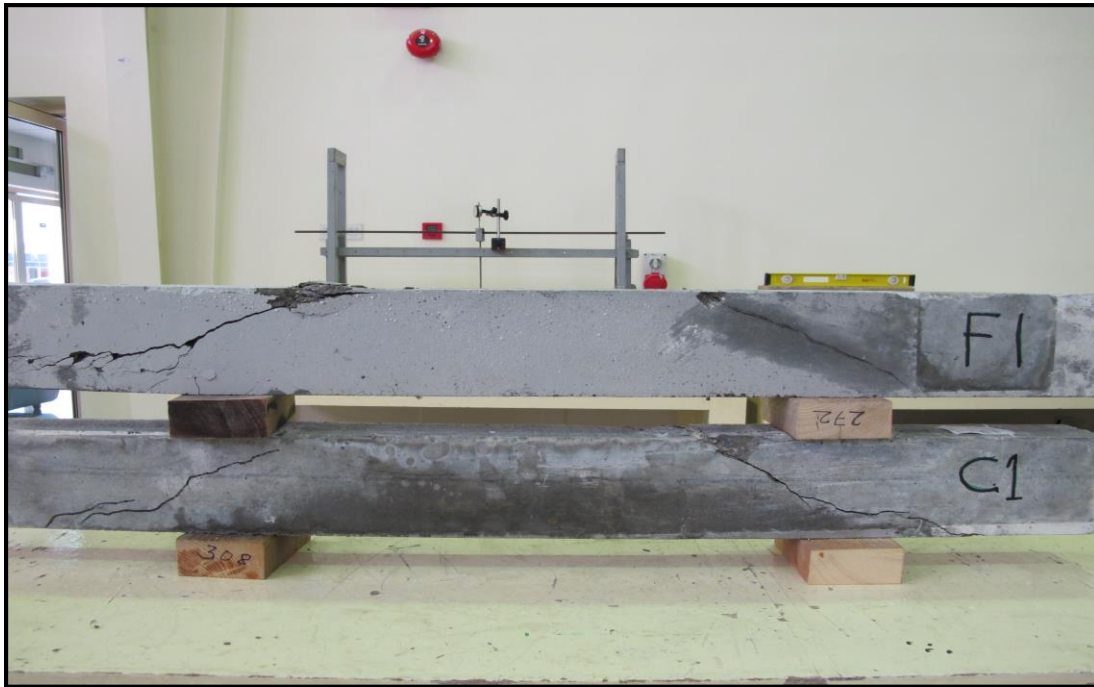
Shear failure mode under static load, for steel fibres, SF1, and control beam, C1.
